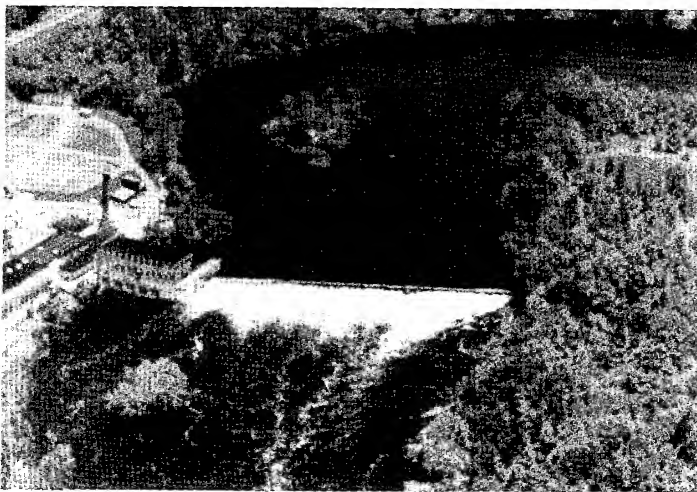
Overview of Dodge Falls Dam Prior to Construction
